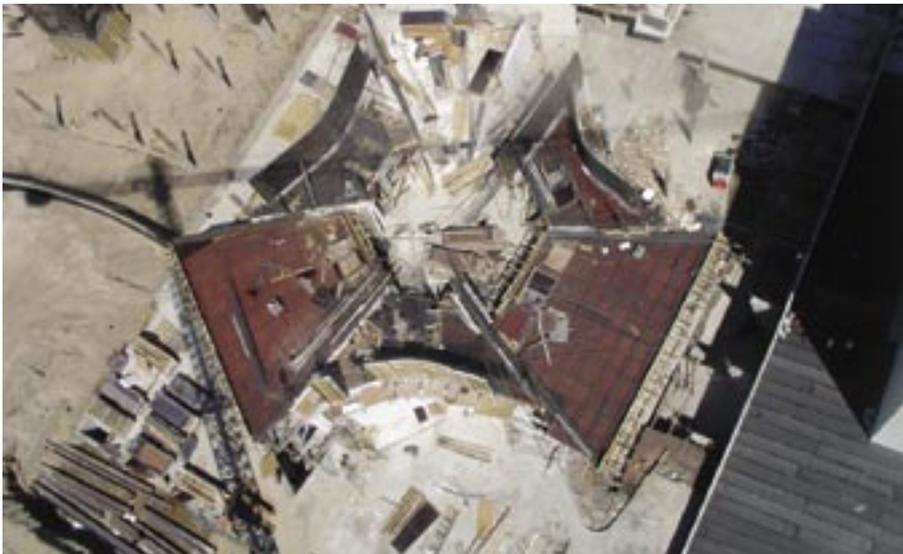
Plan view of CUBE Tower under construction showing the three central cores, two office modules, and the open central space
